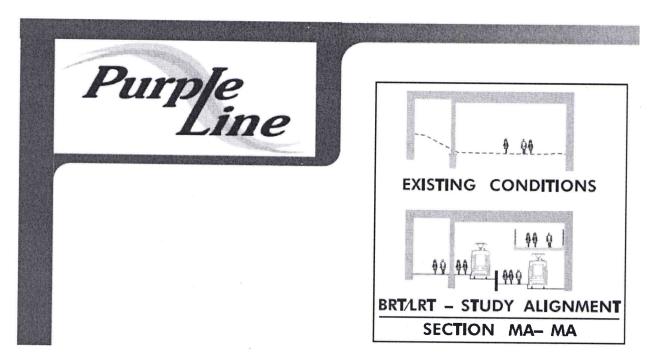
Exhibit G – DEIS Concept of Connection between Purple Line Station and Bethesda Metrorail Southern Entrance Via Elevator
